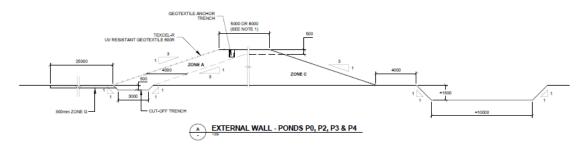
Proposed excavation trench (from Knight Piesold 2018)
